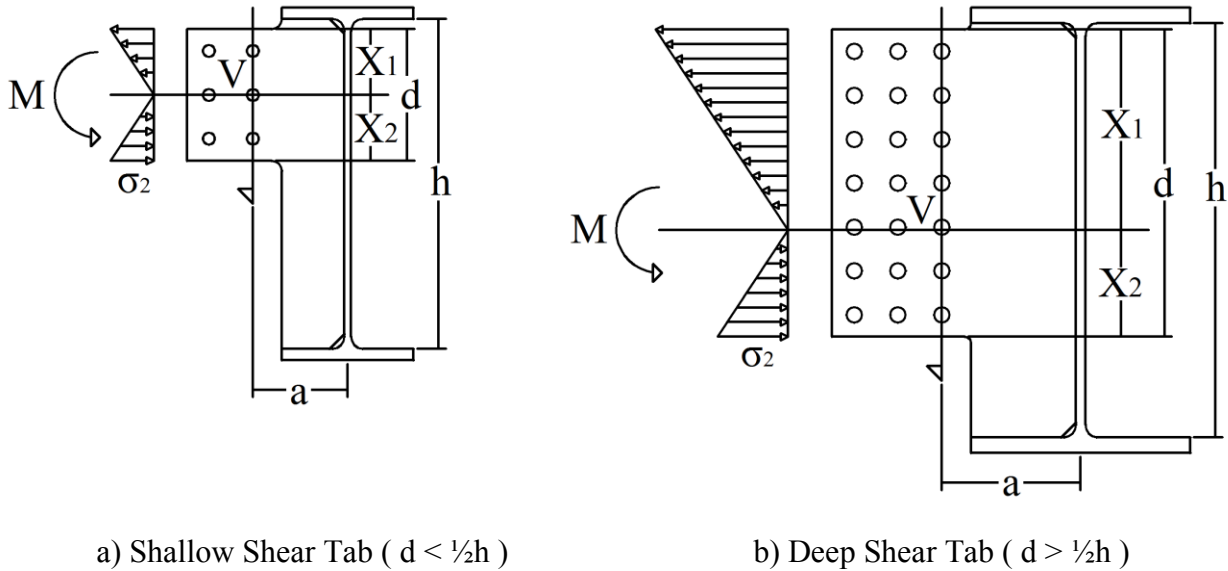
Horizontal Stress for Full Height Beam-to-Girder Buckling Calculation
